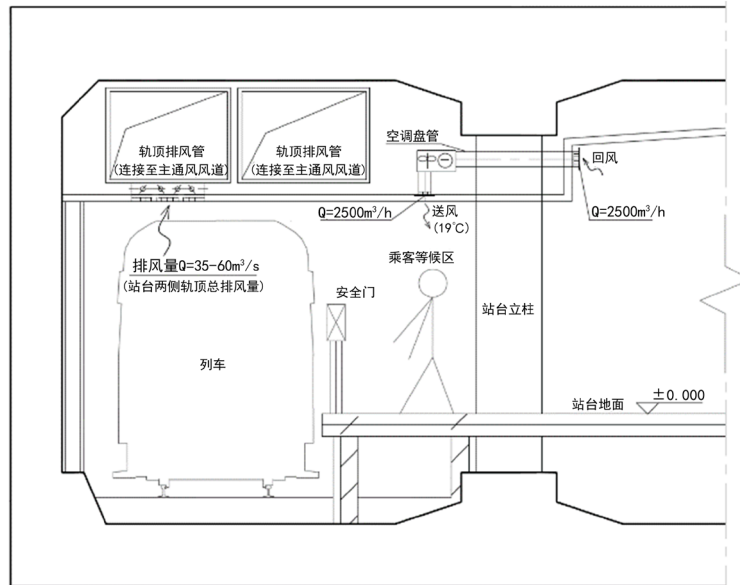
Side view of station-air outlet arrangement of ventilation and air conditioning system
